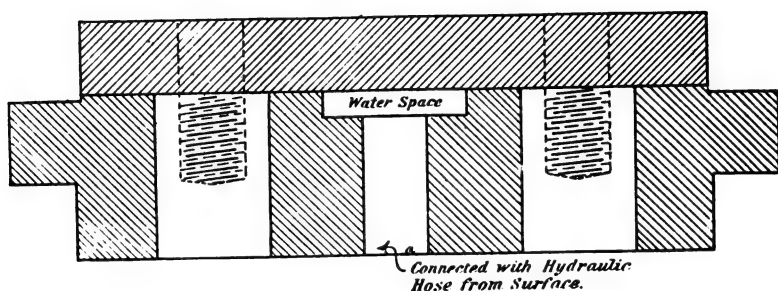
Walker's Patent Piles. Longitudinal Elevation and Section of "Male" and "Female" Piles.
